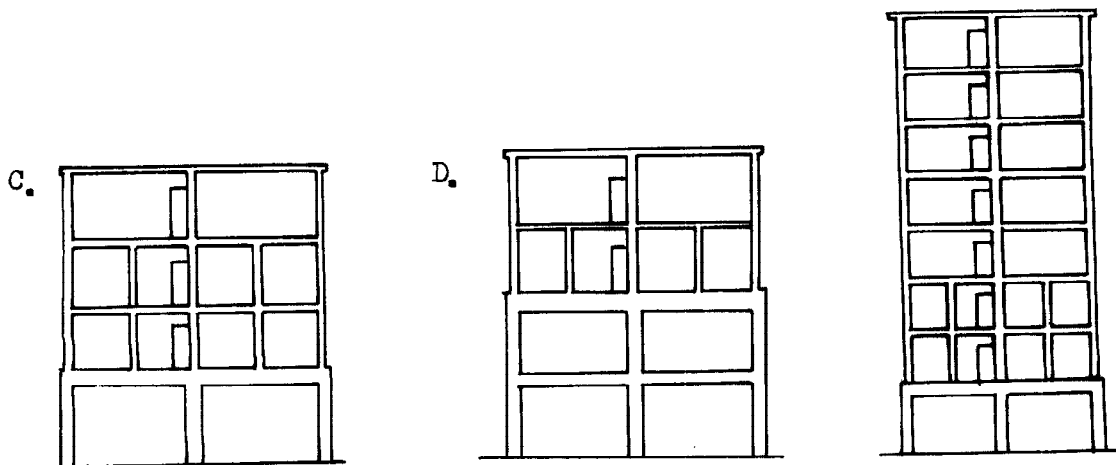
Sketch of the model walls C and D and wall of 8-storey building
